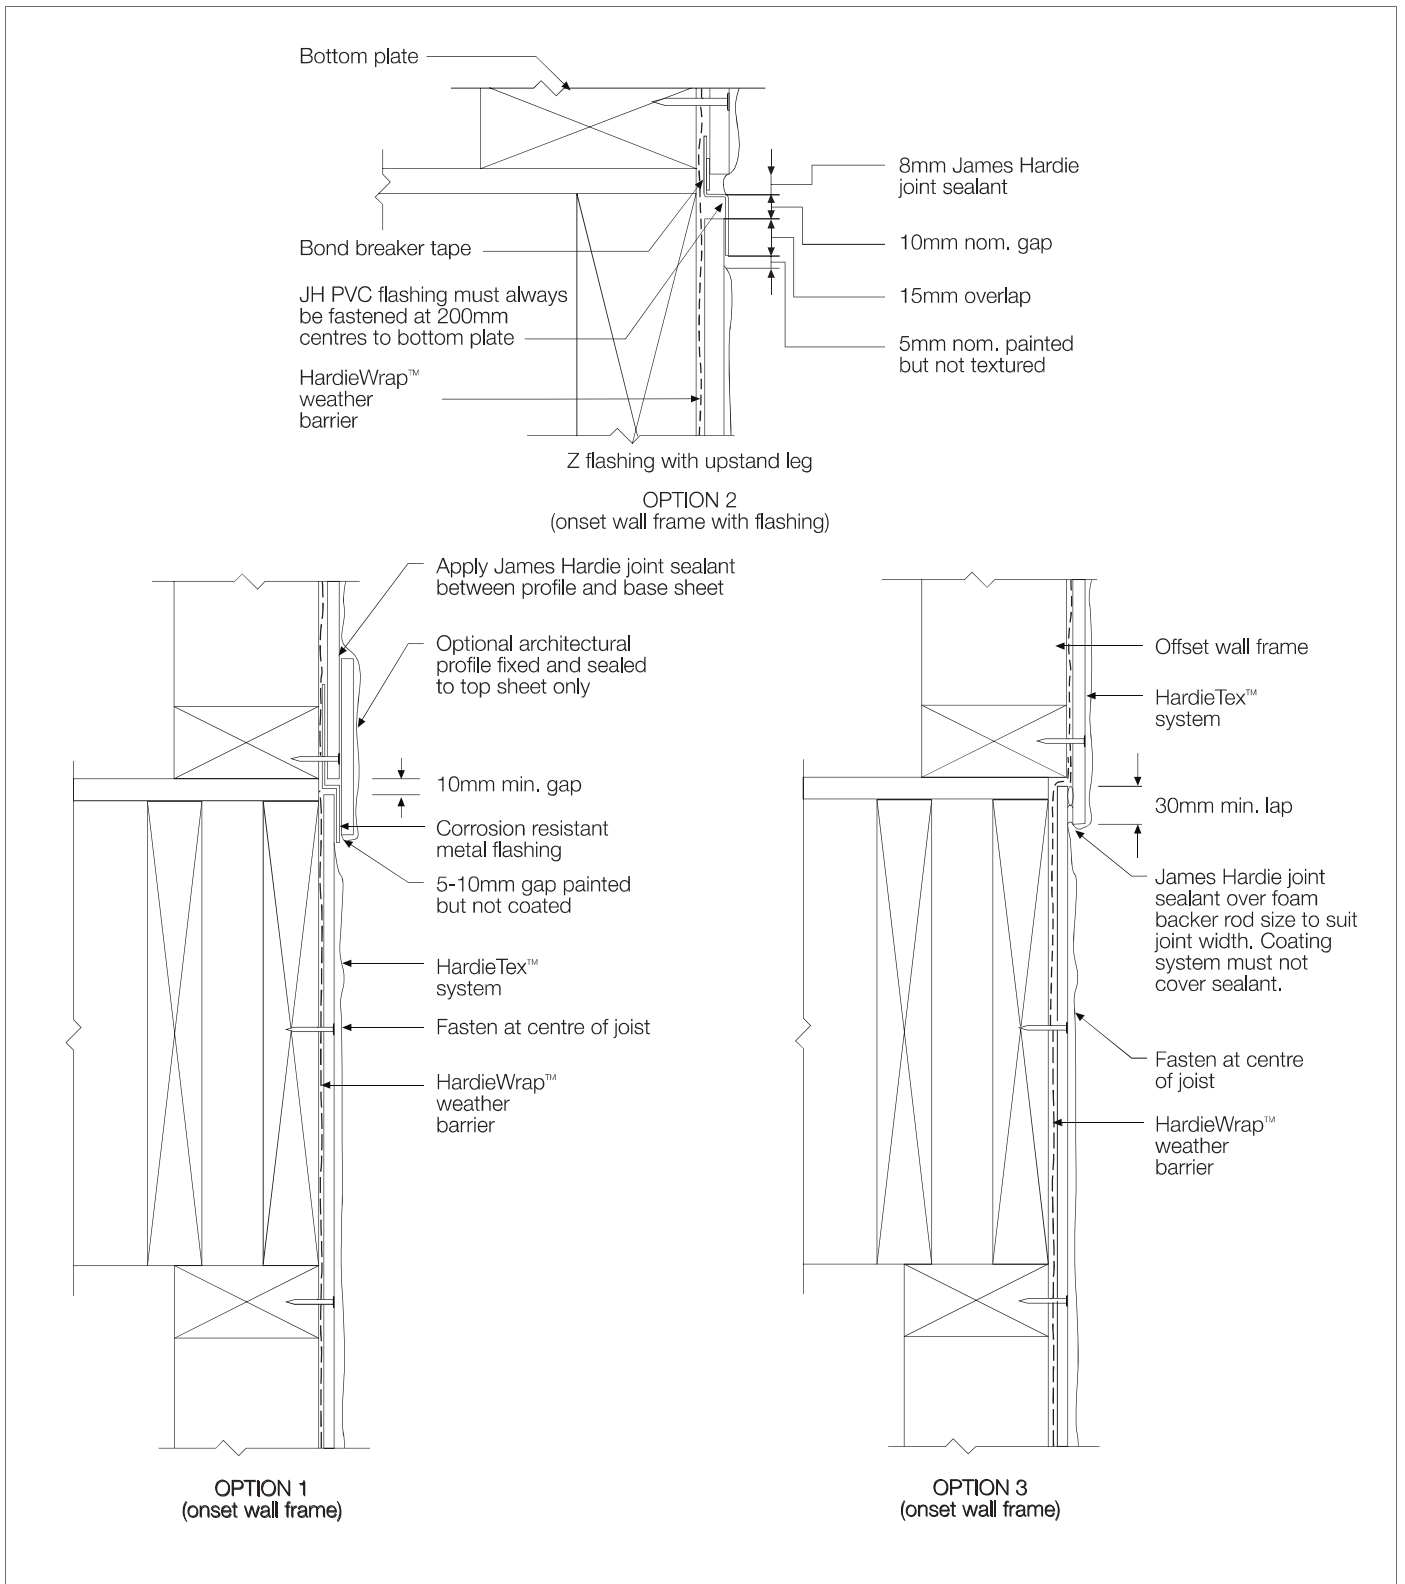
HORIZONTAL CONTROL JOINT - FLOOR JUNCTION OF A TWO STOREY HARDIETEX WALL
